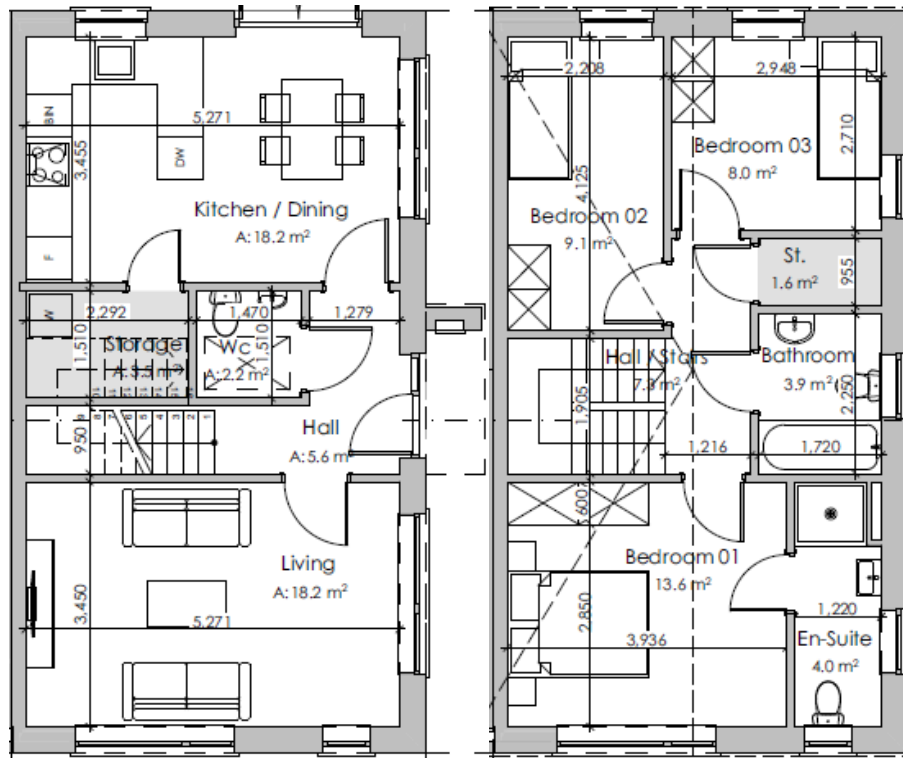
Ground (l) and first (r) floor plans of House Type 3.5.
